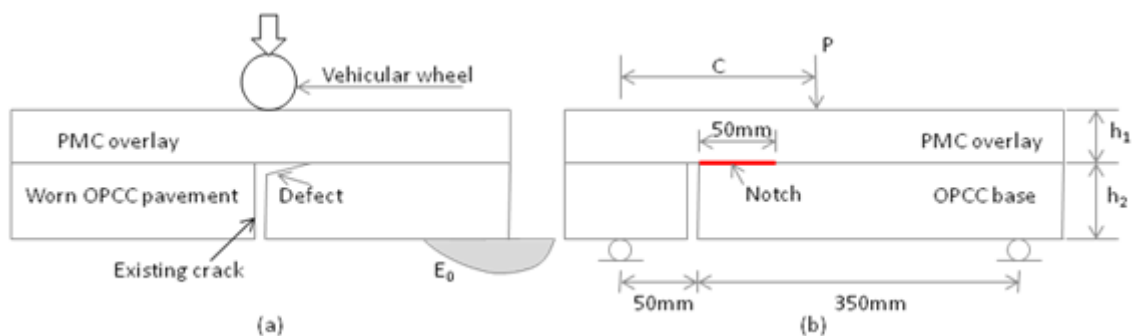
(a) concrete overlay bonded on worn concrete pavement system, (b) composite beam with interfacial crack under three-point bend for measuring the interfacial fracture toughness
